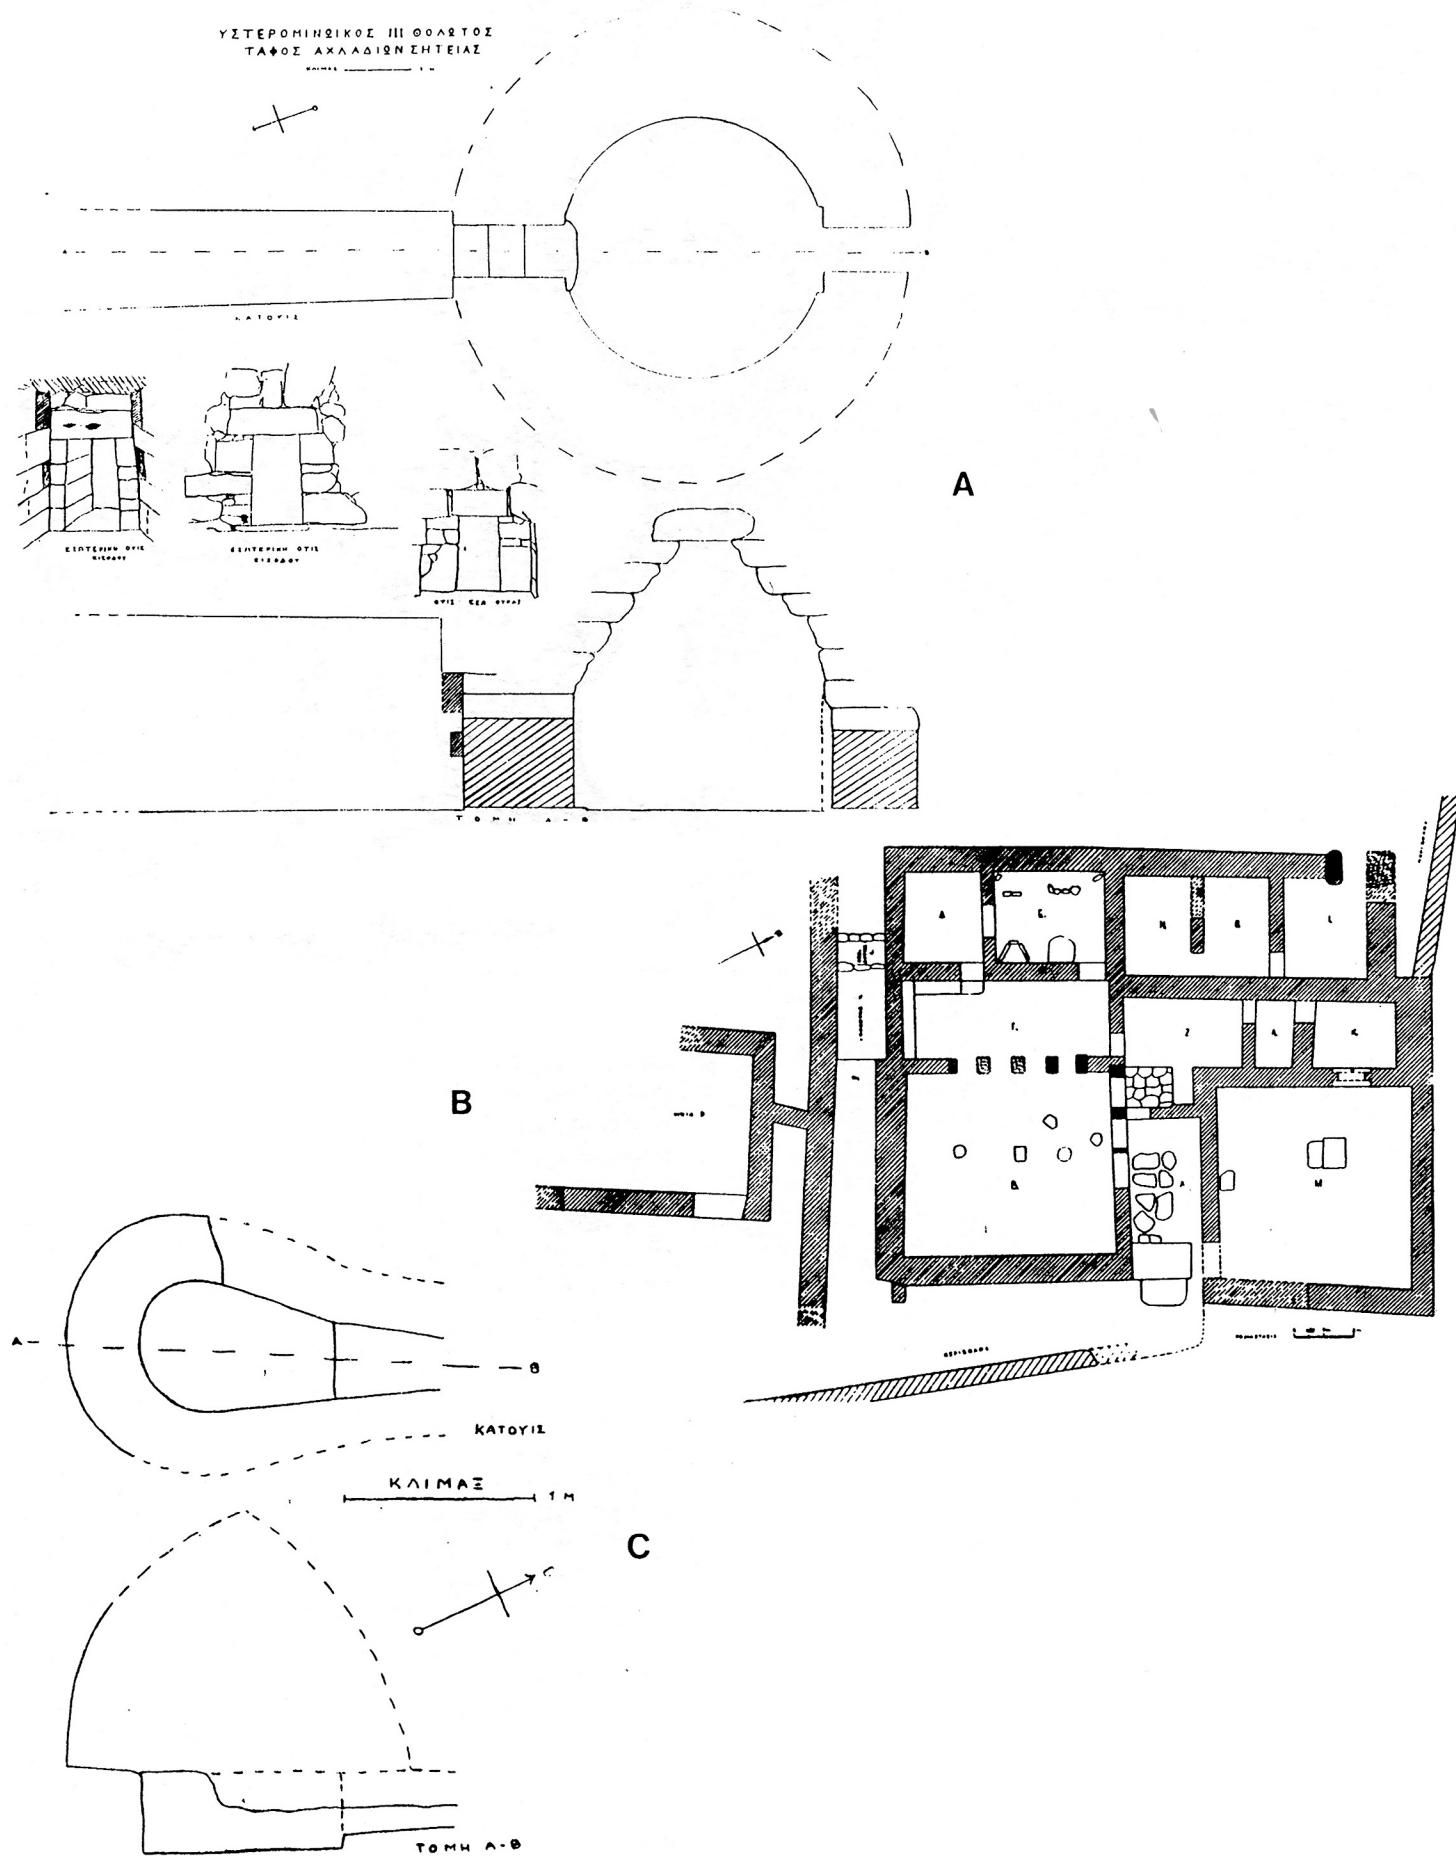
A: plan, section and details of the tholos tomb. B: The Neopalatial buildings at Riza. C: kiln (after Platon 1952 and 1959).
